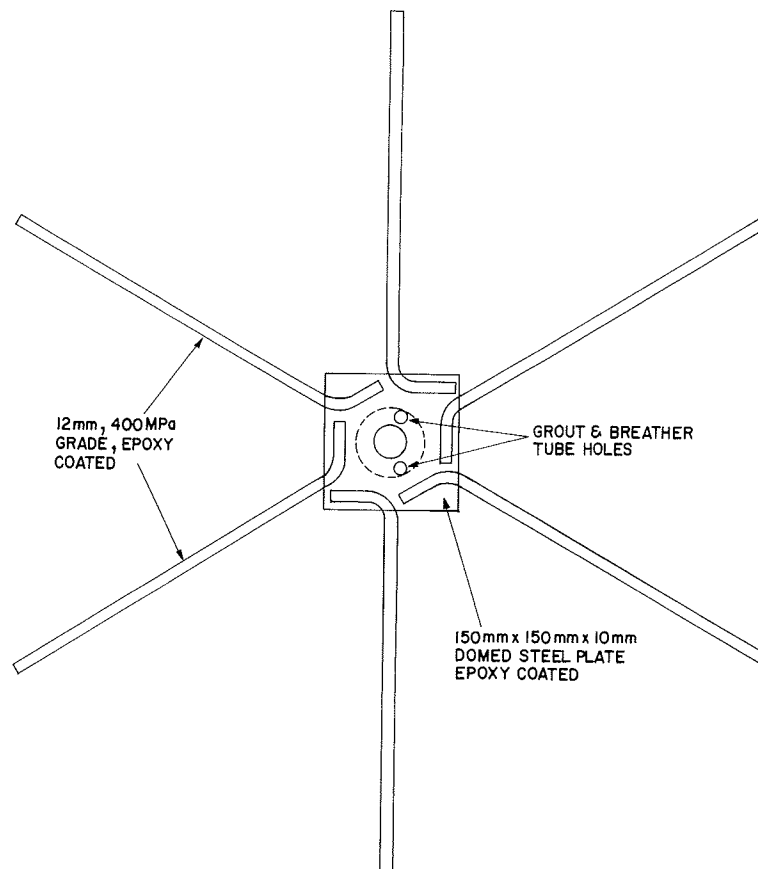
Spider rockbolt plate used on Eastern Distributor to ensure adequate connection between shotcrete and rockbolts.
